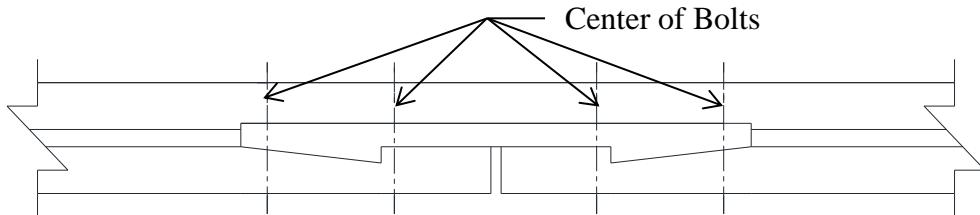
Plan view of bottom chord splice joint between V3 and V4
